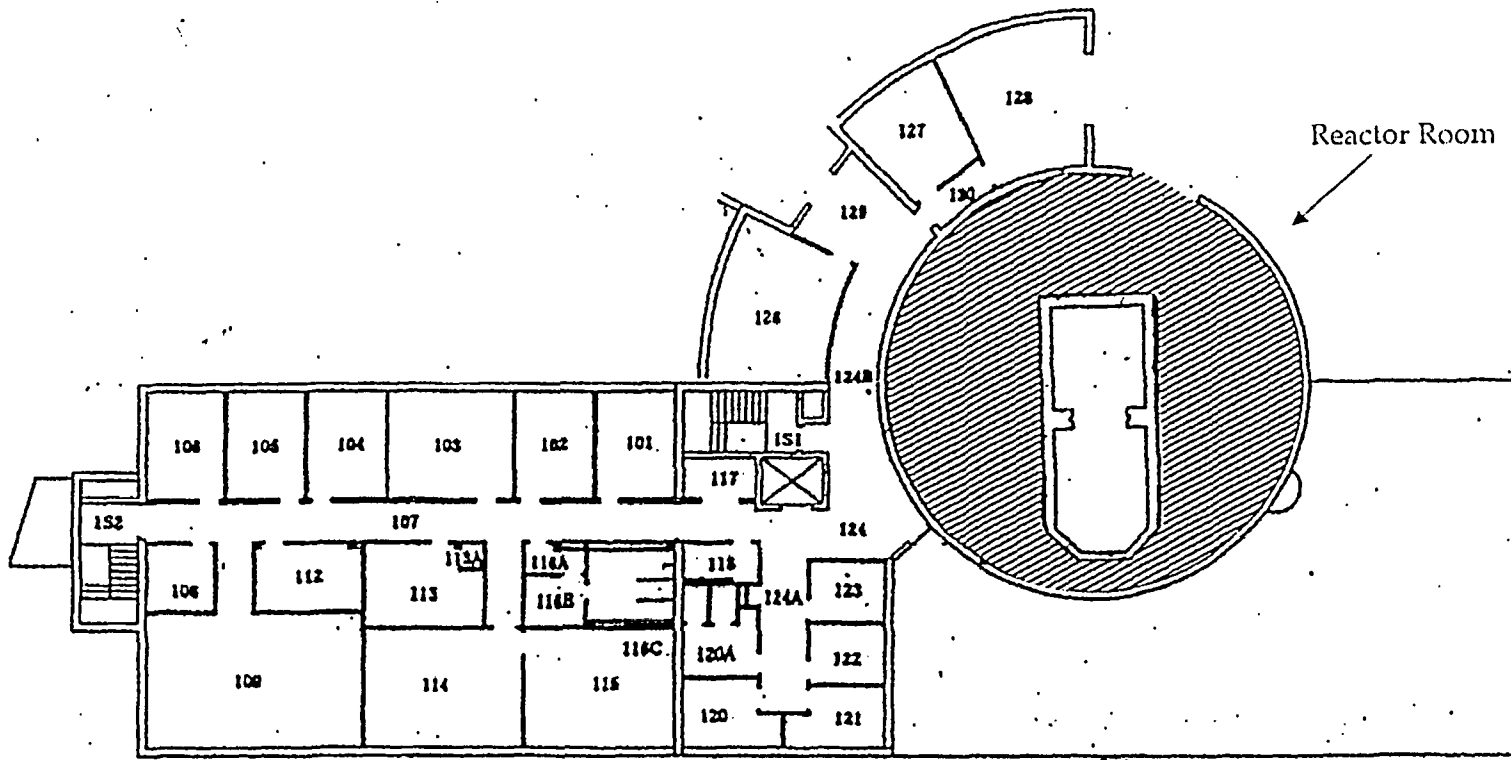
UVA Reactor First Floor Plan View Indicating the Location of Soil Fill Around Reactor Pool.
